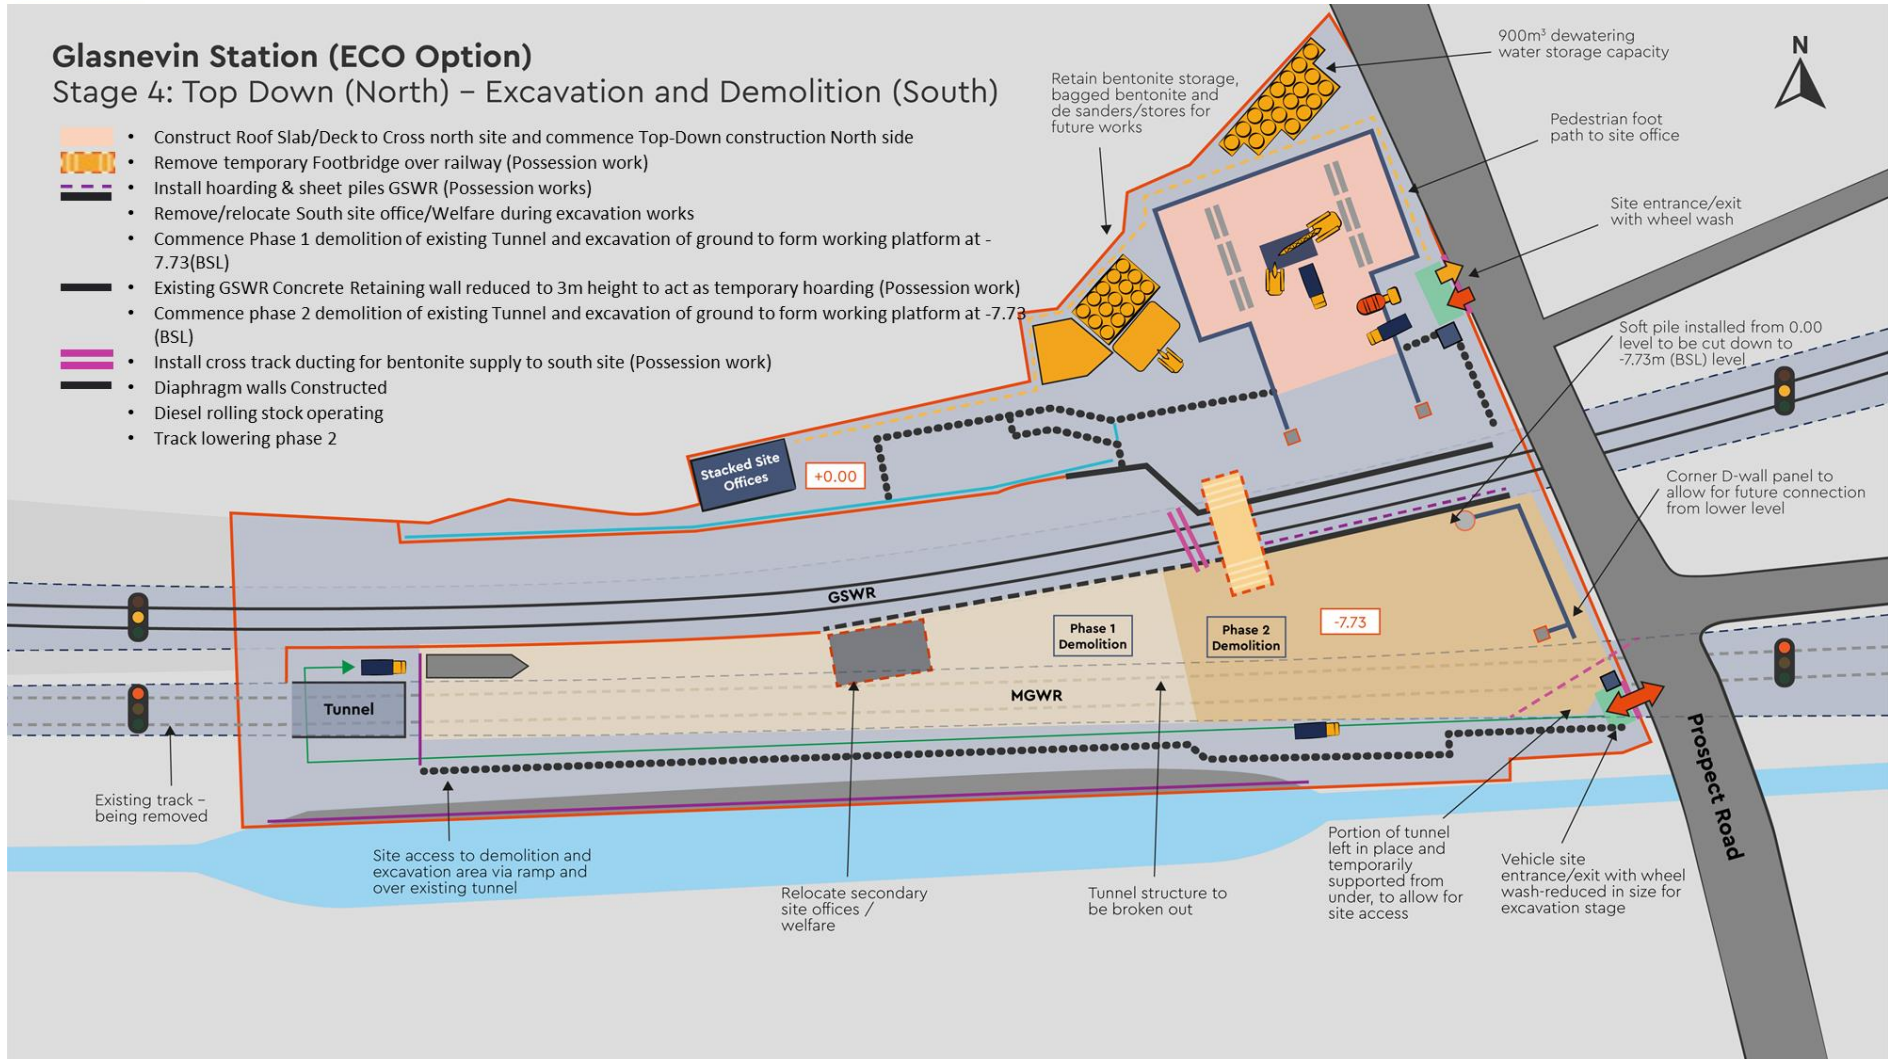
Glasnevin Station - Stage 4 Top Down (North) - Excavation and Demolition (South)
